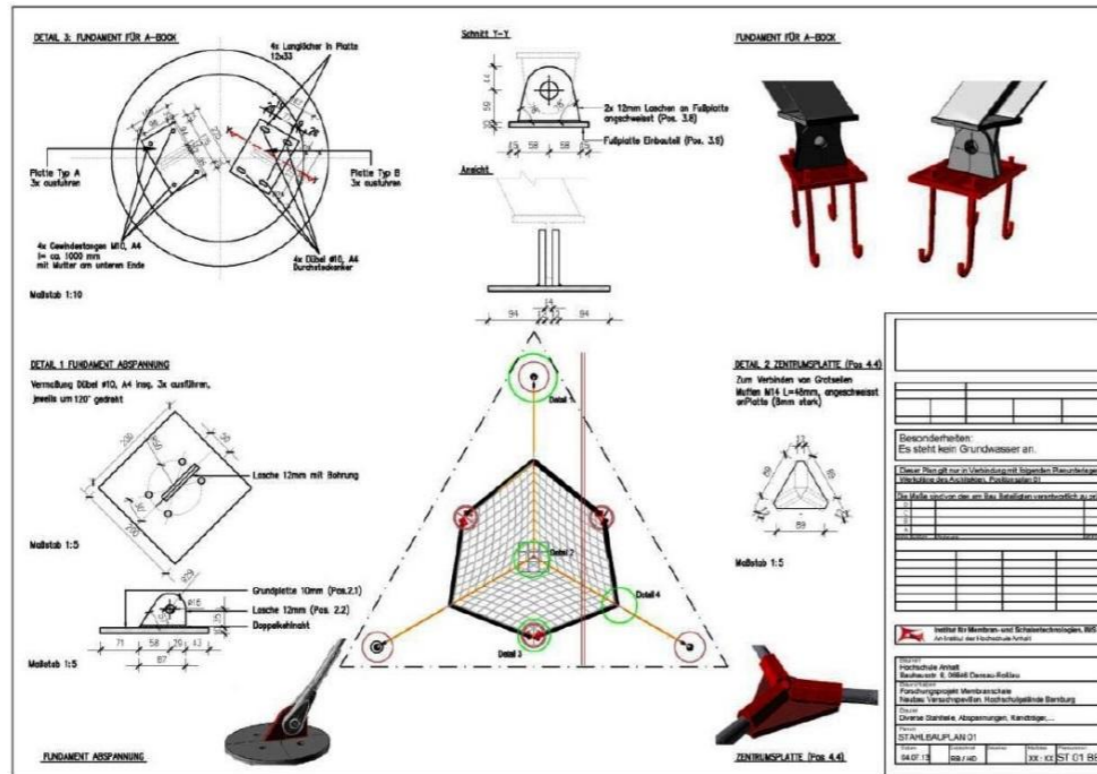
General Arrangement, Base Plates, Membrane, Steel Edge Members, and Steel Connection Details.
